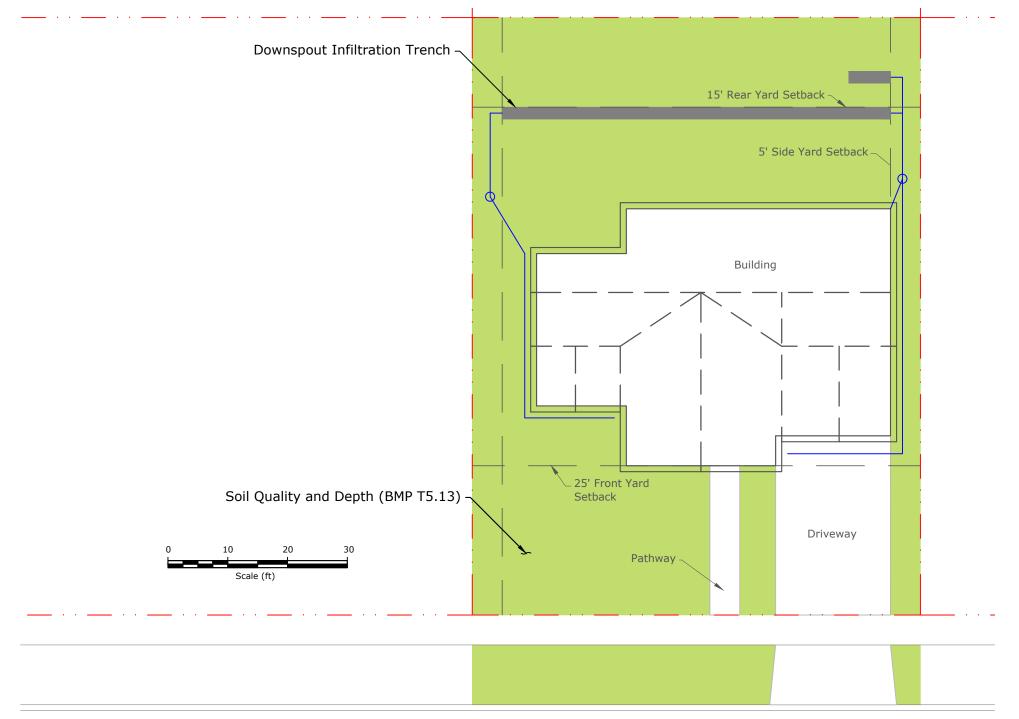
Scenario 1. Permanent Stormwater Site Plan – Typical Single-Family Residential Parcel, 2005 Requirements, Outwash Soils
